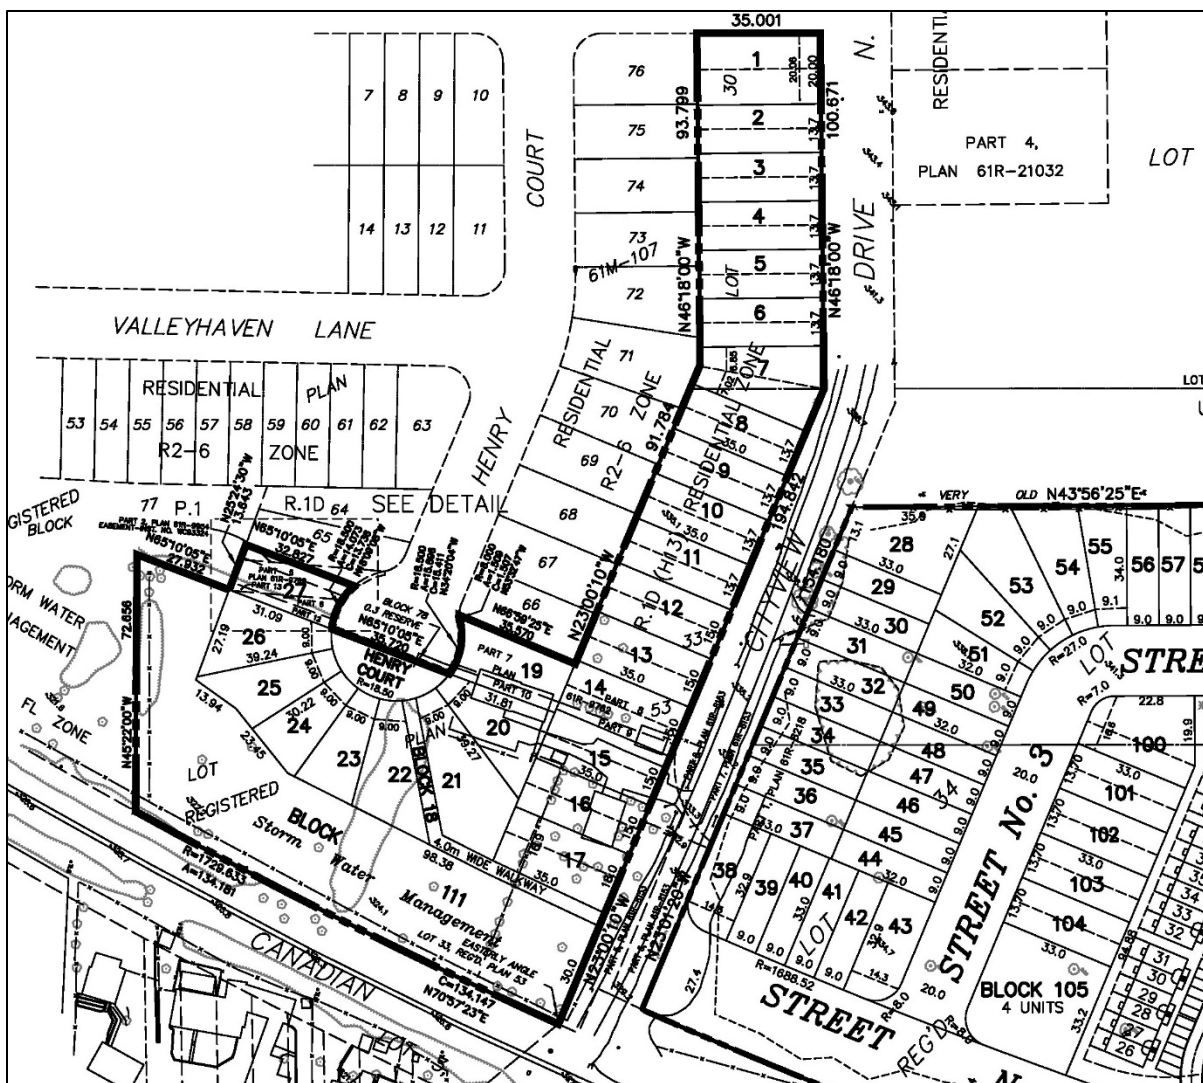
Excerpt from proposed site development concept (Source: BSR&D / JD Barnes)
